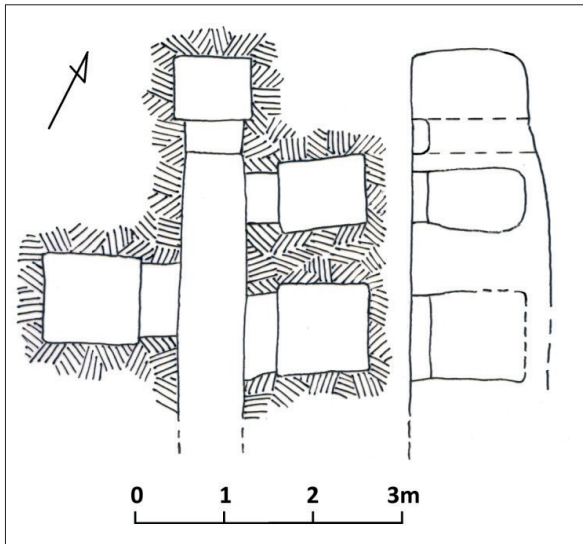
Cave 119A, plan and section. Adapted from: Xinjiang Qiuci shiku yanjiusuo 2001, p. 61
